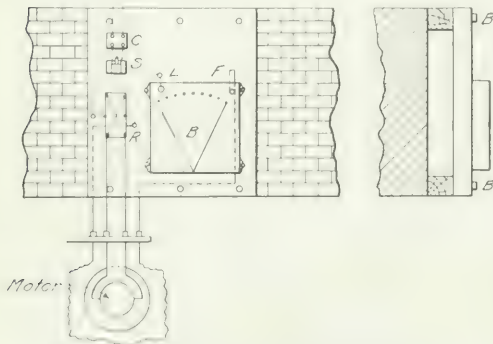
and 5—Front and Side Elevation of Slate Slab.
